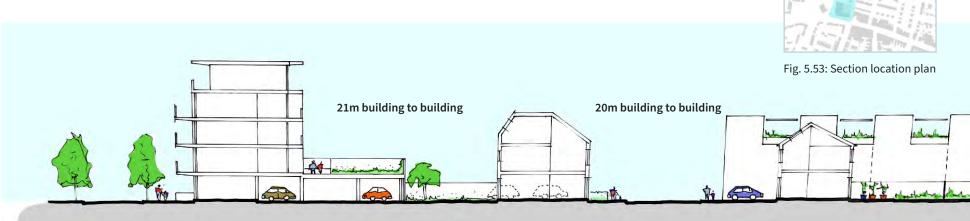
Illustrative section showing decreasing density from Grove Street towards Moilliett Street Park
